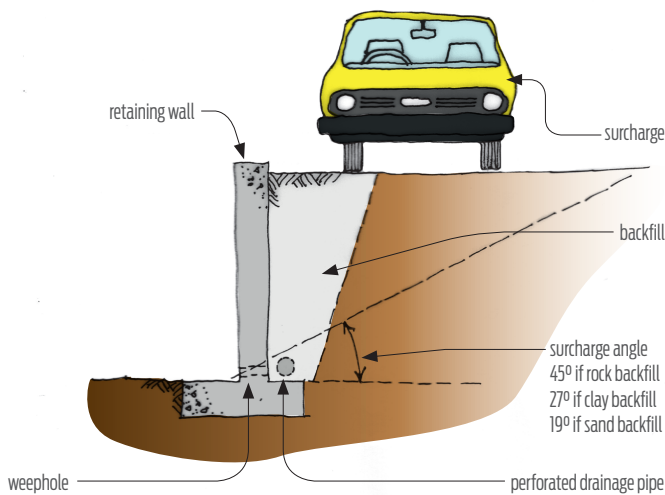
Retaining wall with additional surcharge - roadway above the wall.
